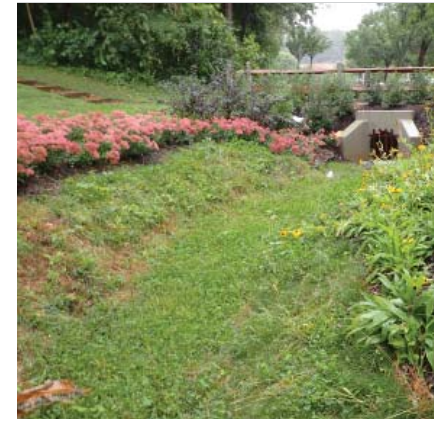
Examples of Stormwater Swales in Philadelphia
